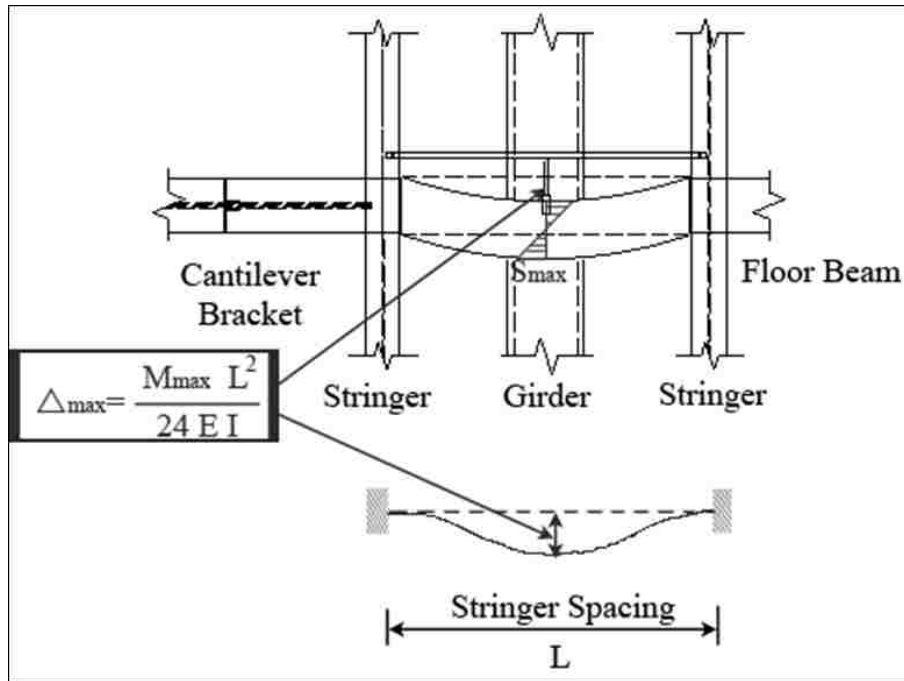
Plan view of stringer-to-floor-beam connection and fixed-end beam theory
